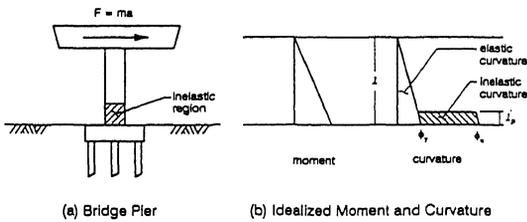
Idealized Flexural Curvature in Cantilever Bridge Pier
